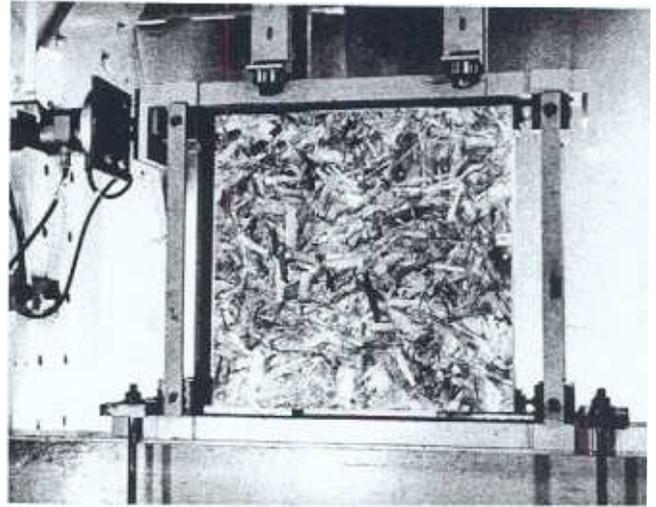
A 2- by 2-foot test frame subjected to a racking load.
